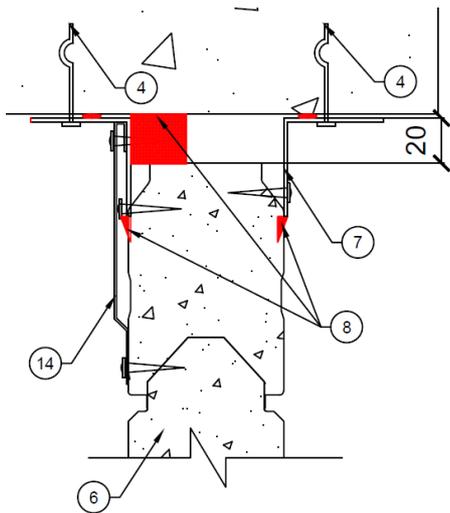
Head Detail for Horizontal Speedpanel Wall
